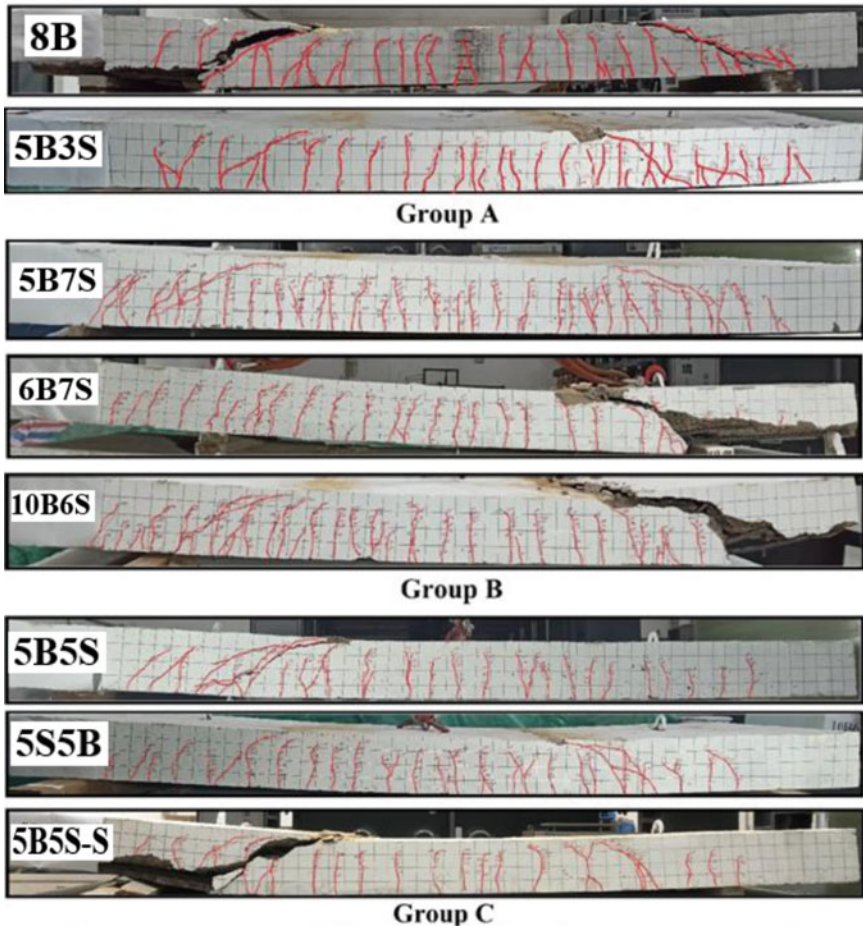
Cracking patterns and the failure modes of the tested slabs
